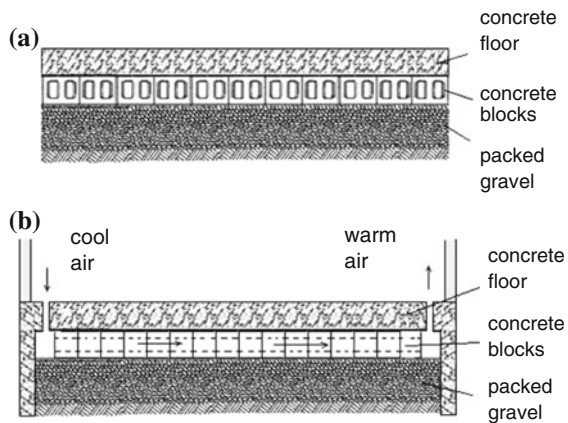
View of a concrete block and hot air-storage system. a End view of floor. b Side view of floor
